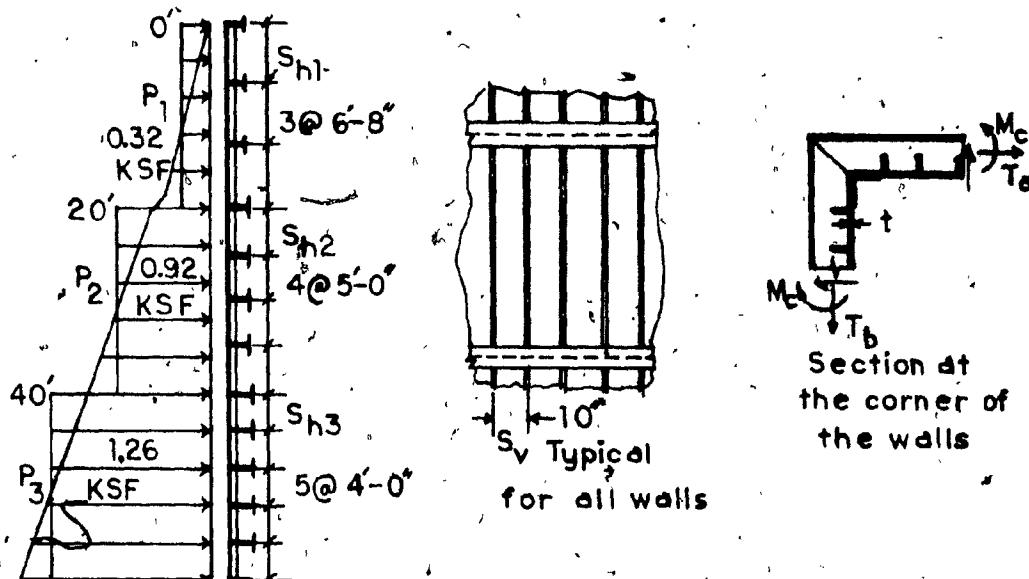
Spacing and detailed arrangement of stiffeners
